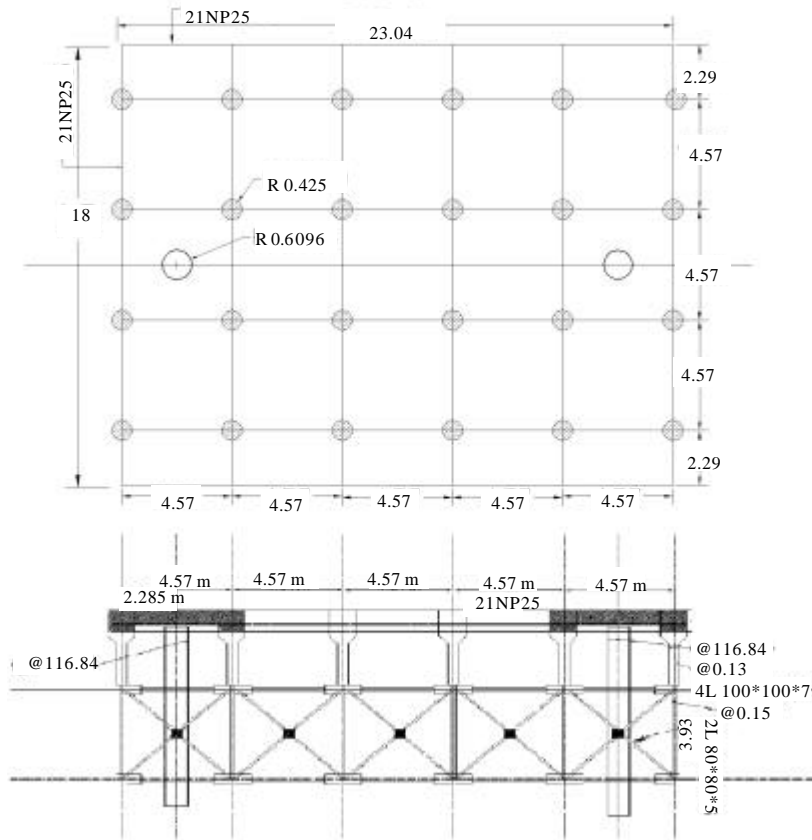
Plan, cross-sectional view and section details of East Wharf of Imam Khomeini Port in repair and improvement state
